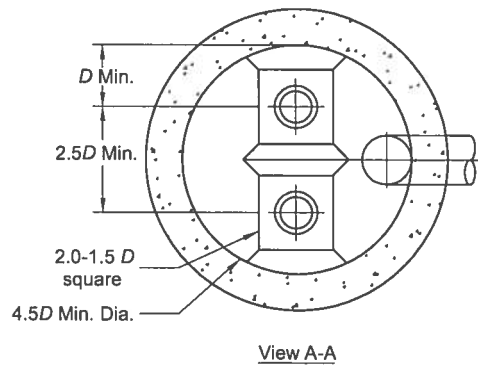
Circular wet pit with sloping walls and minimized horizontal floor area (dry-pit pumps)
